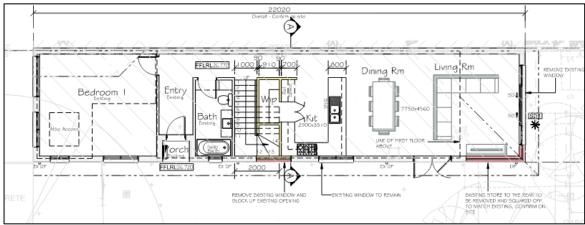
Proposed Ground Floor Plan (Sydney Drafting Concepts & Design).
